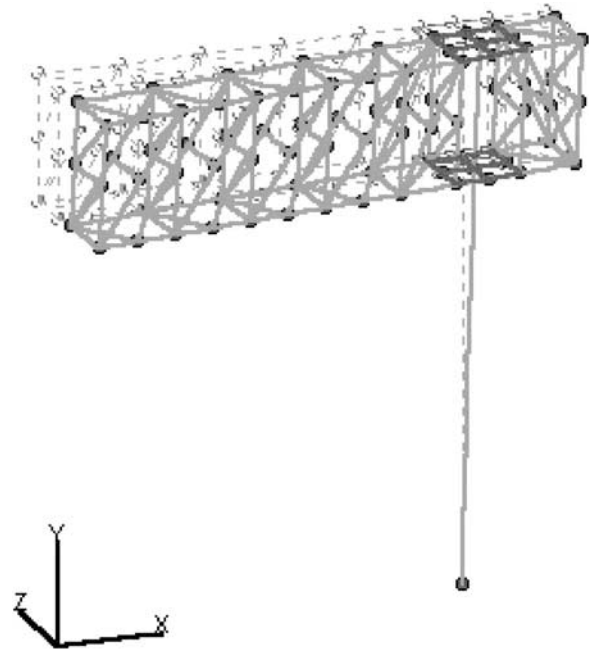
First-mode shape (out-of-plane) of Caltrans box-truss VMS structure.
